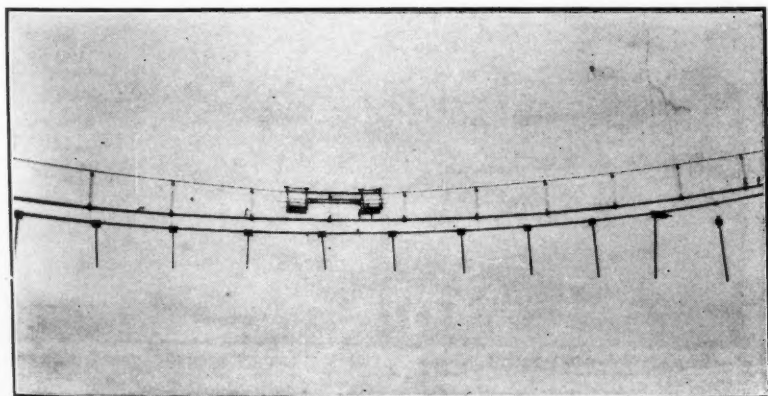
SOUTH EYE-BAR CABLE, SELF-SUPPORTING AND FREE OF ROPES, 4:00 P. M., APRIL 2, 1925, FLORIANOPOLIS BRIDGE.
